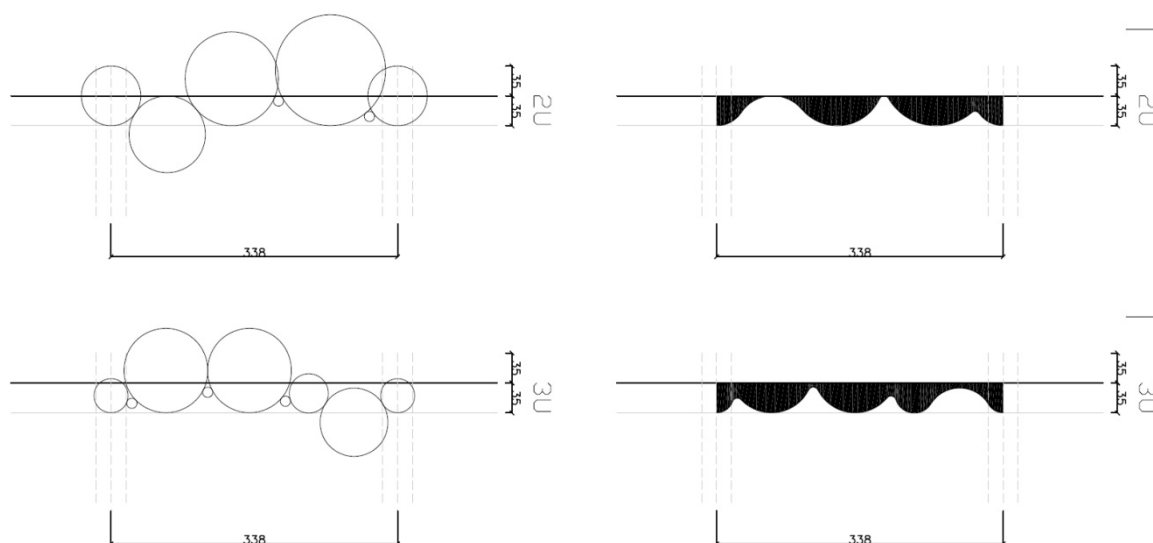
preliminary acoustical proposals for sinusoidal-like shape of reinforced concrete walls
